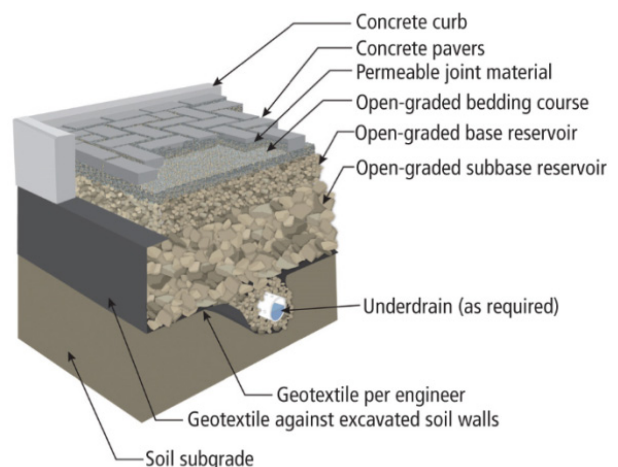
Typical Cross Section of Permeable Block Pavement (Smith, 2011)
